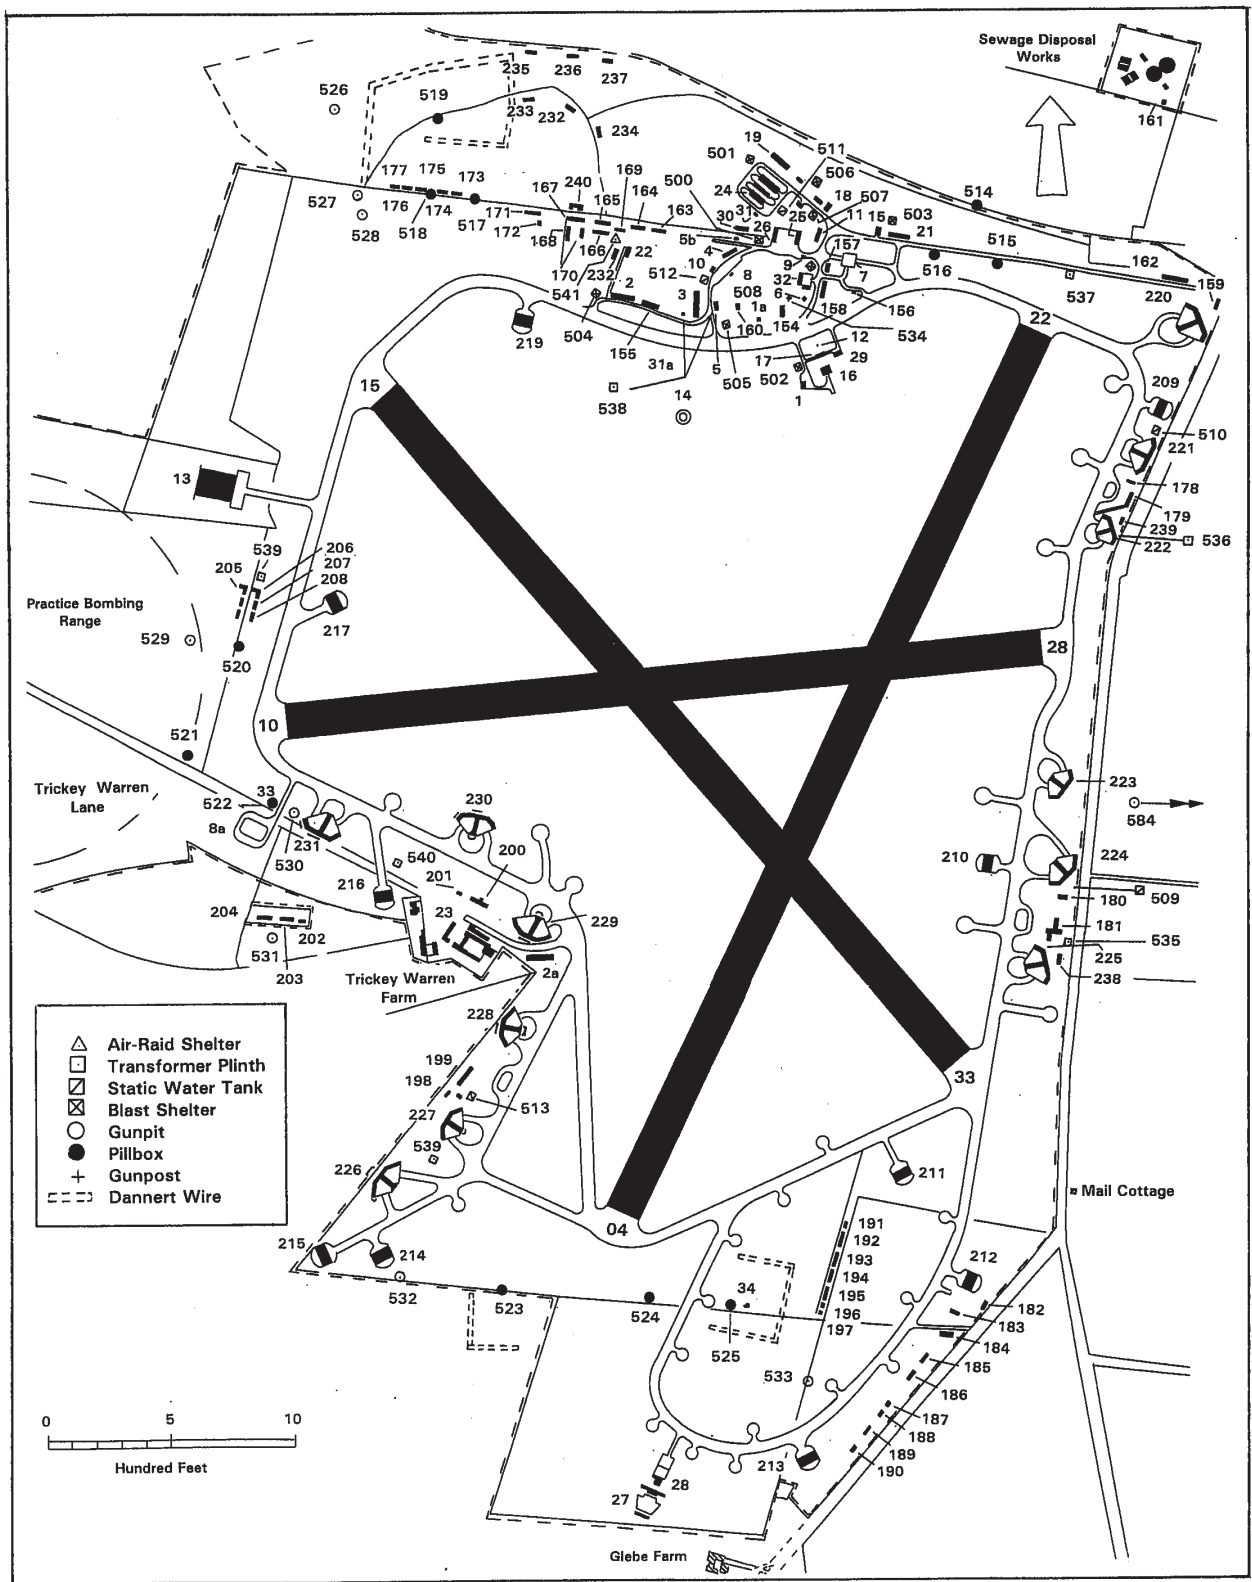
Culmhead Airfield site plan (1945). Based on Air Ministry plan 4997/45 and showing Air Ministry building numbers.
